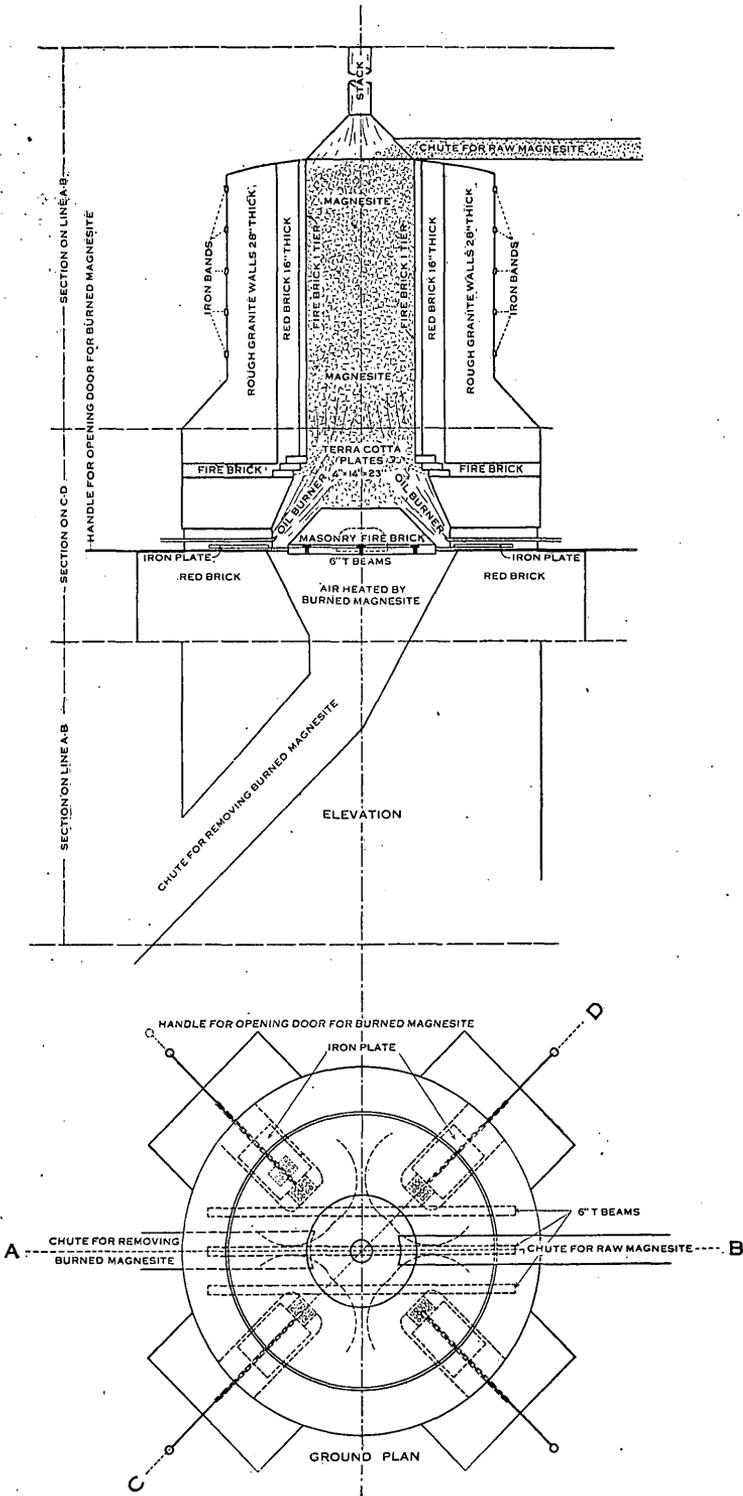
Elevation and plan of Willamette Pulp and Paper Company's furnace, 4 miles northeast of Porterville, Cal.
